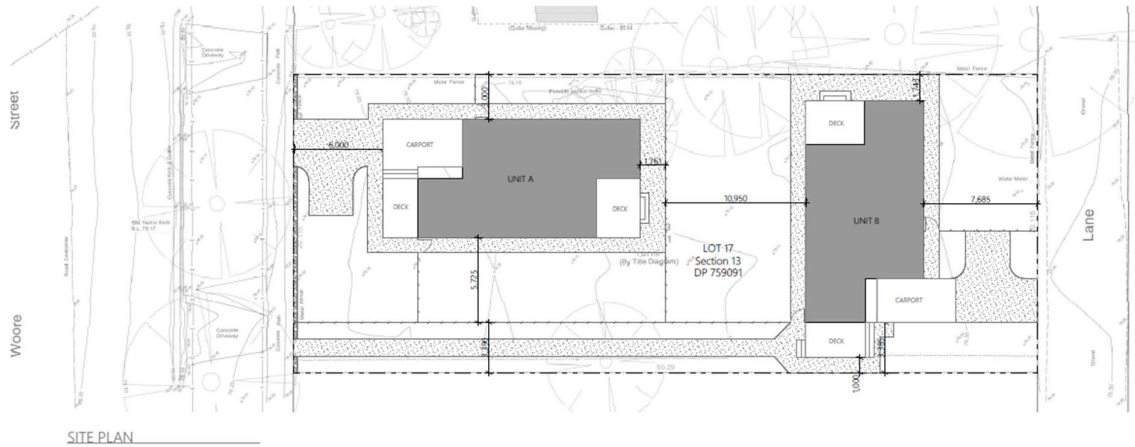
Proposed landscape plan and works for 71 Woore Street, Wilcannia – 2 dwellings.
